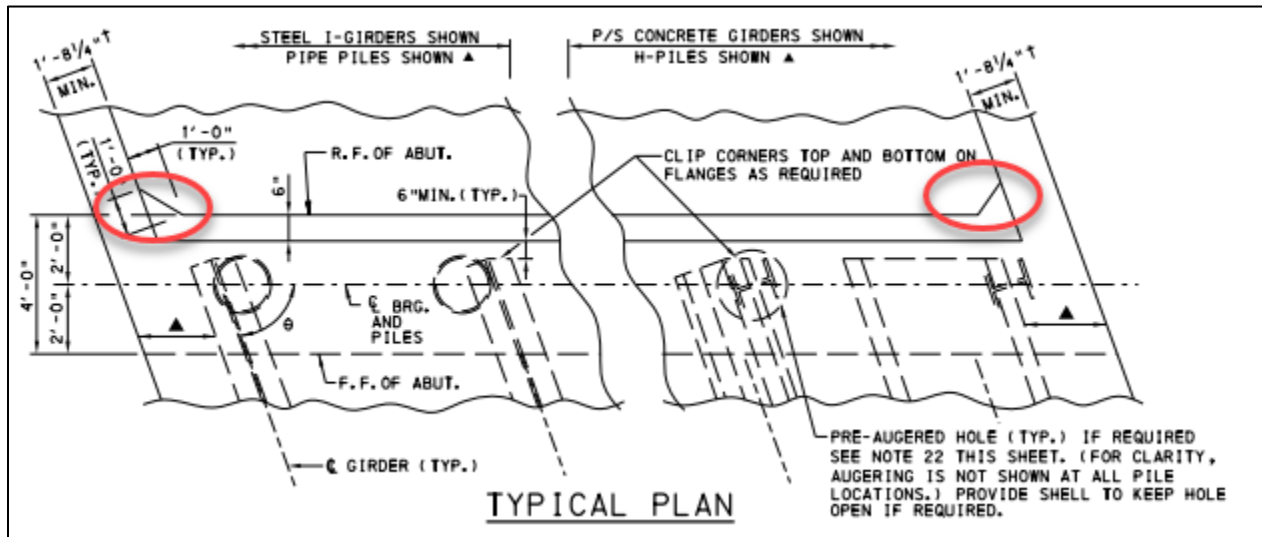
Plan View of Integral Abutment with Chamfers at Attached Wings from BD-667M
